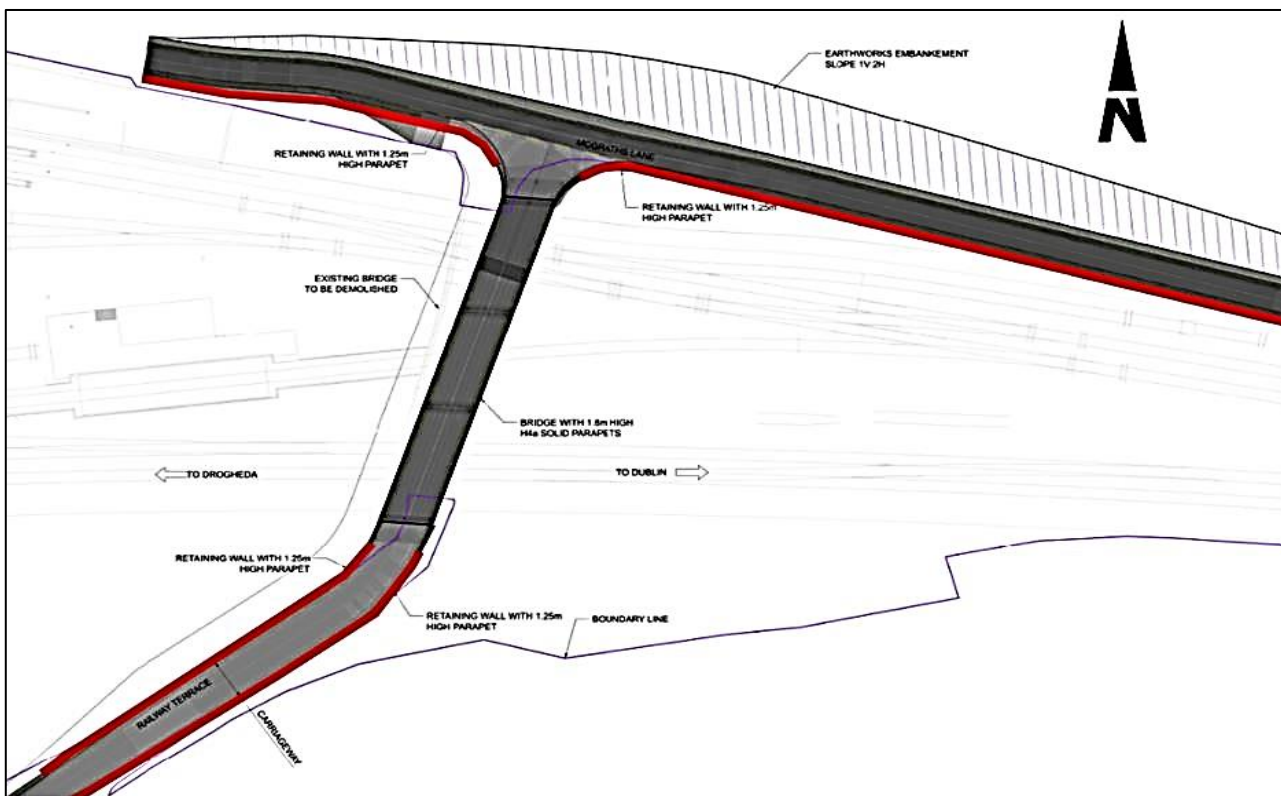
Overbridge OBB80 Extents of retaining walls (red lines)
